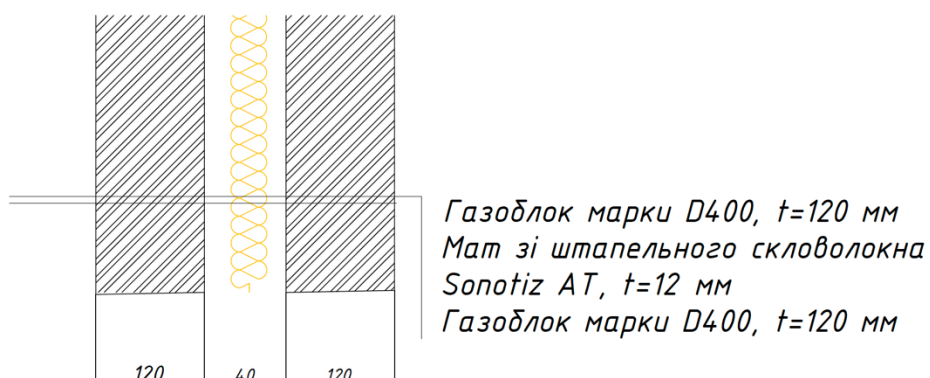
Cross-section of the tested wall assembly No. 33/25
